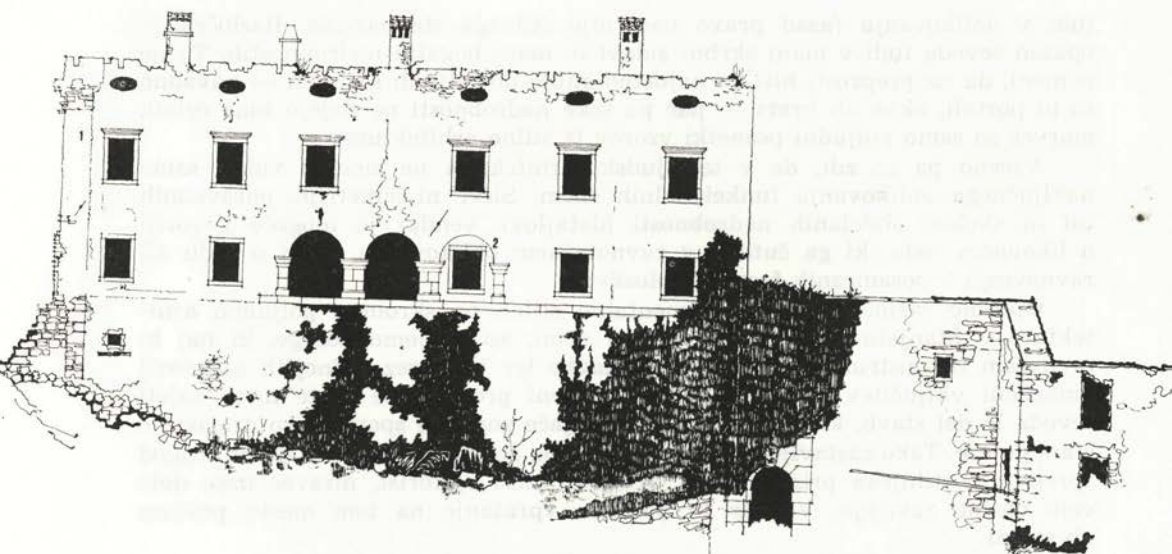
Castle Tract, from the 17th century: the reconstructed roof with a »linda« (a space alongside a house, under its eaves) at the backyard side, below can be seen the remains of a vaulted passage on consoles, before its reconstruction (Photo by Dr. N. Sumi)
